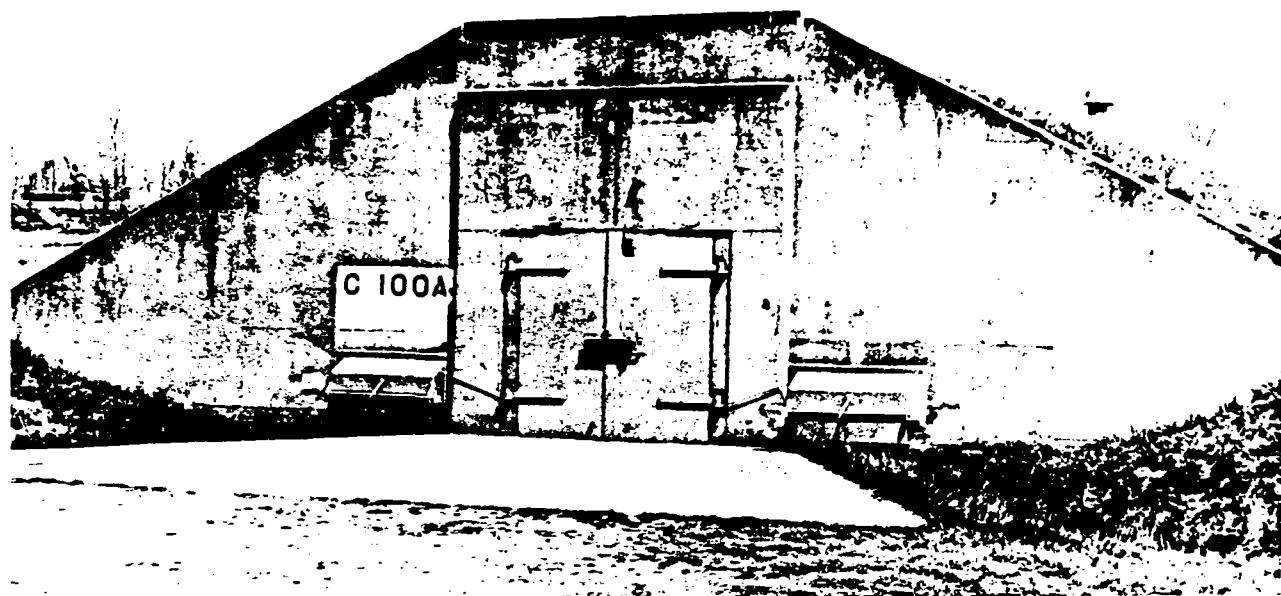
Igloo C100A, Blue Grass Facility. This reinforced concrete, earth-covered structure is typical of the 802 ammunition storage igloos at the Blue Grass Depot. (Source: Field inventory photograph, 1982, William A. Brenner, Building Technology, Inc.)
